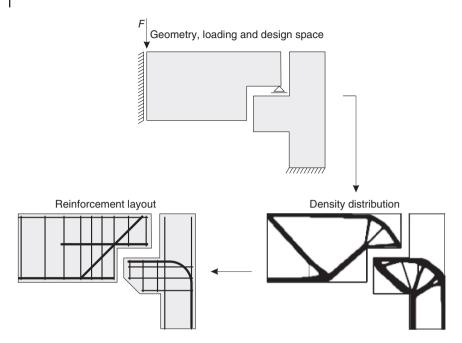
Optimization aided reinforcement design for a stepped beam placed on a corbel.
